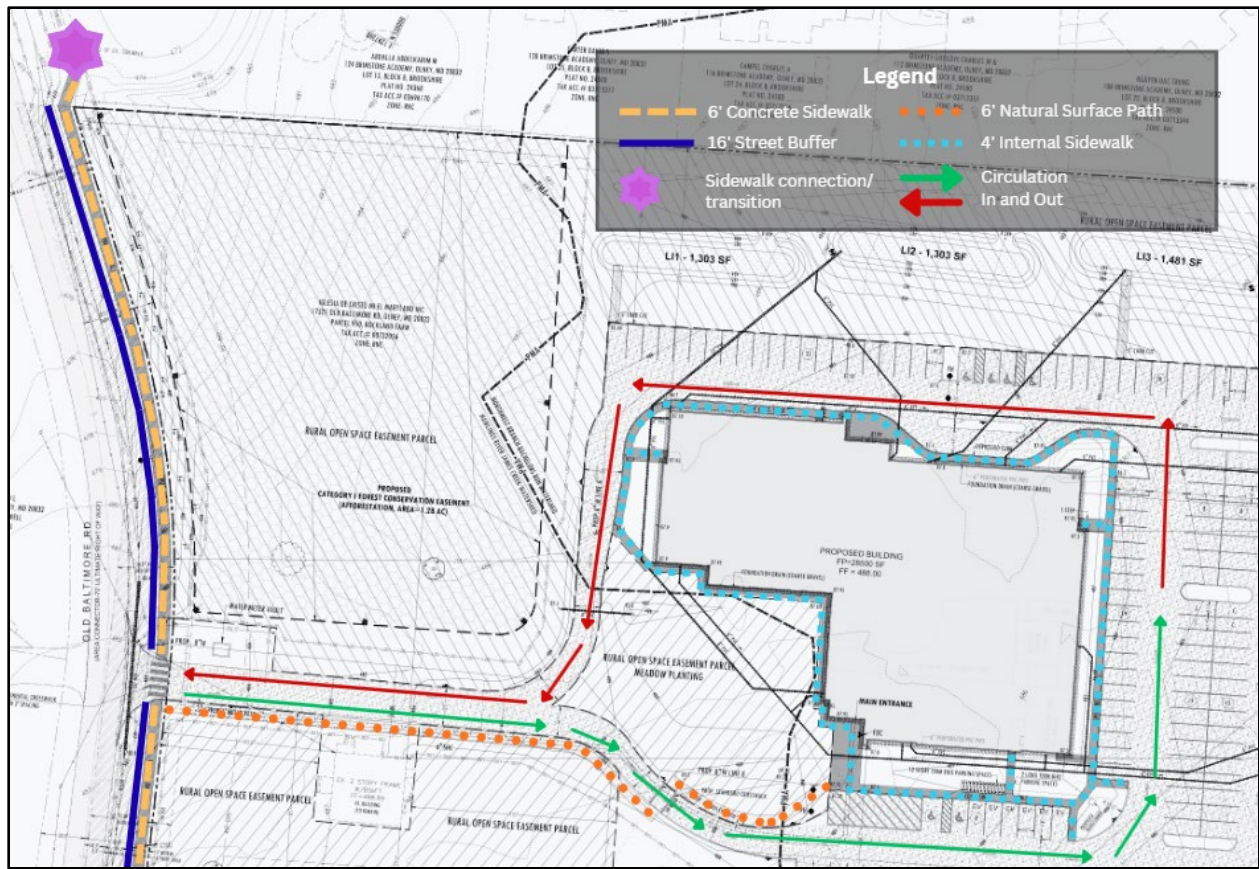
Proposed Circulation, Frontage Improvements, and Connections, as conditioned.
